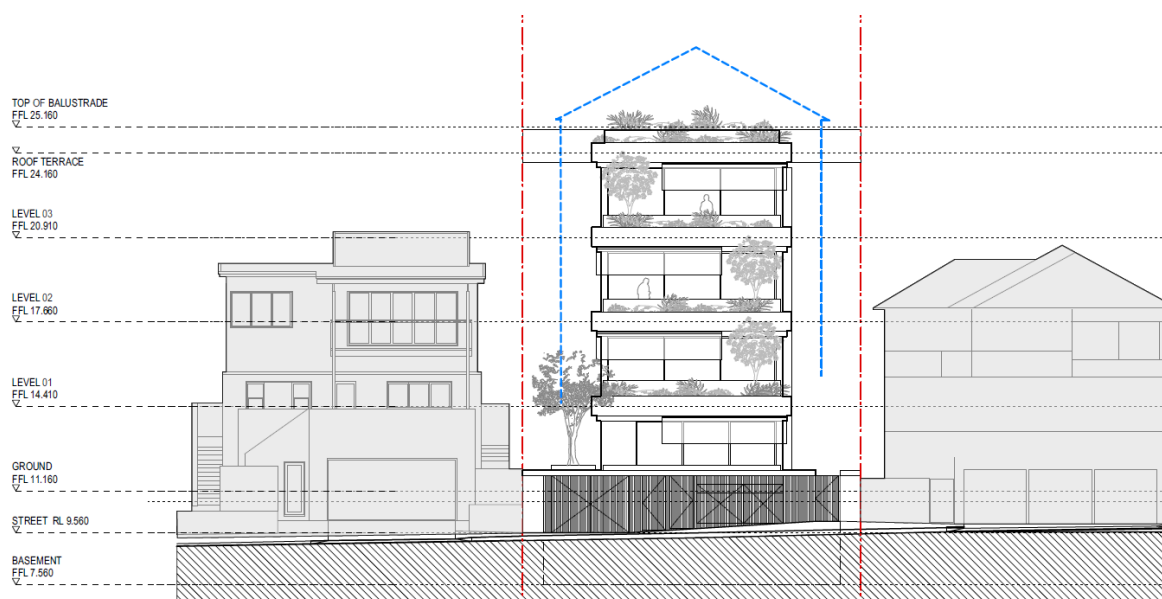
south elevation: existing, proposed and adjacent dwellings
